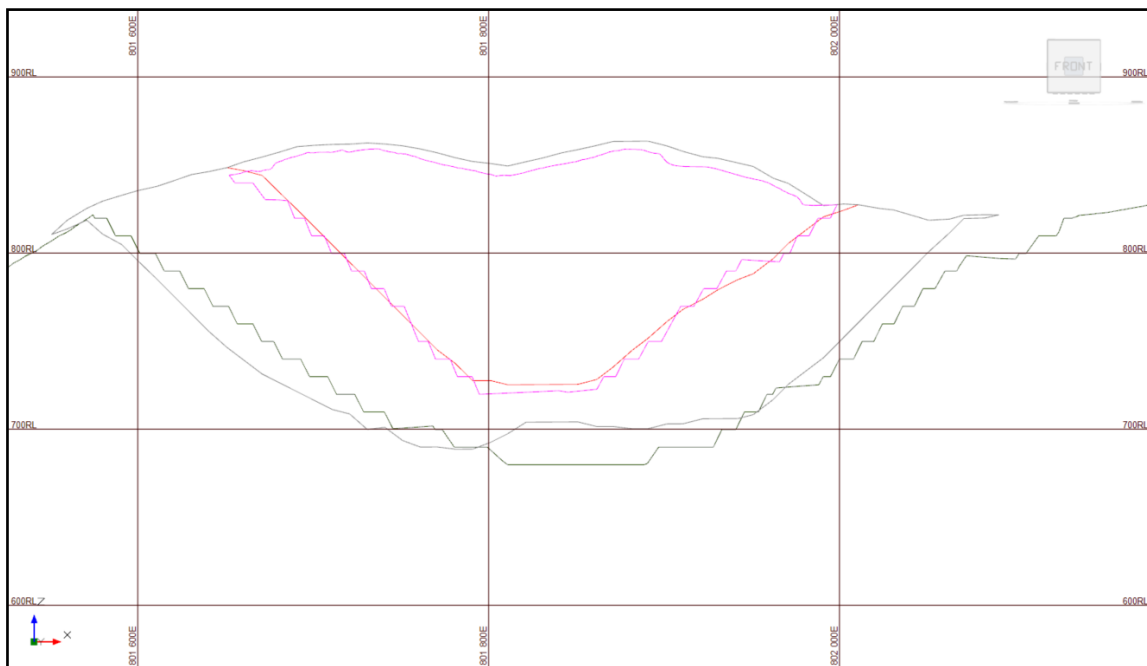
Cross Section (Looking South) Showing Pit Optimisation Shells and Pit Designs
